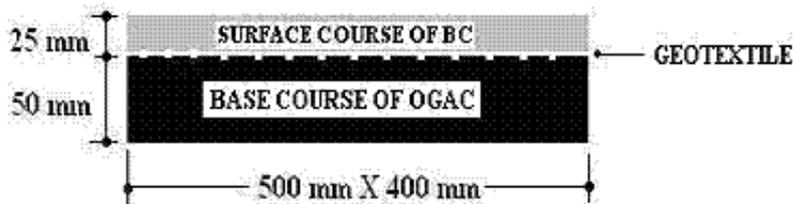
Typical sketch of woven geotextile reinforced OGAC overlay test slab.
